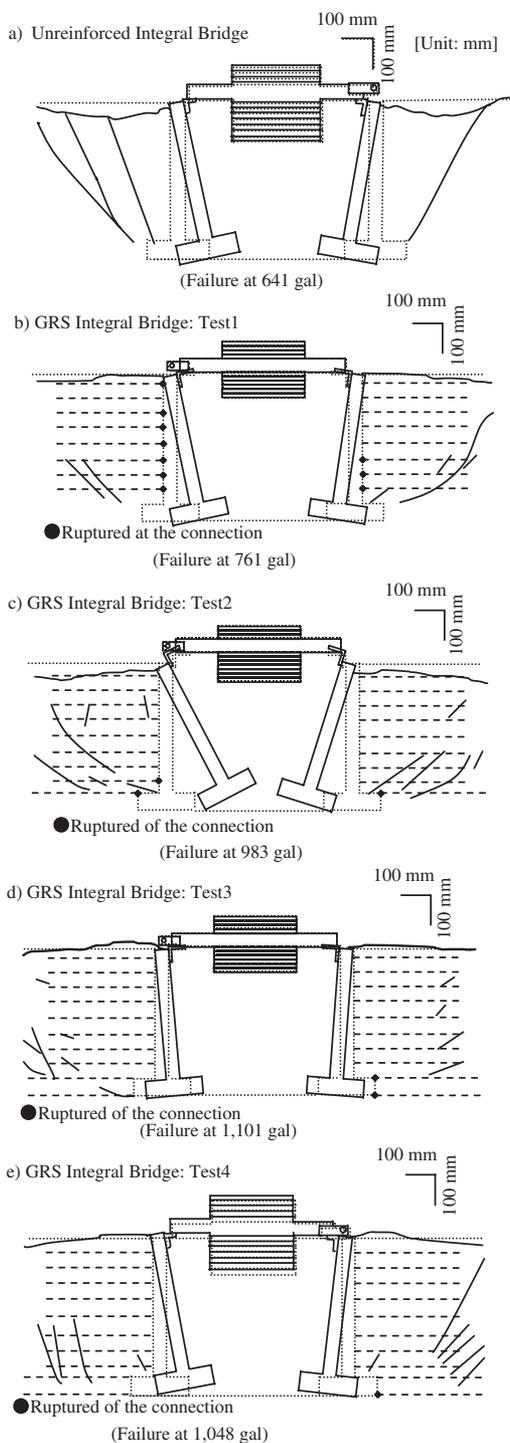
Failure modes of a) unreinforced integral bridge and b)-e) GRS integral bridges.
